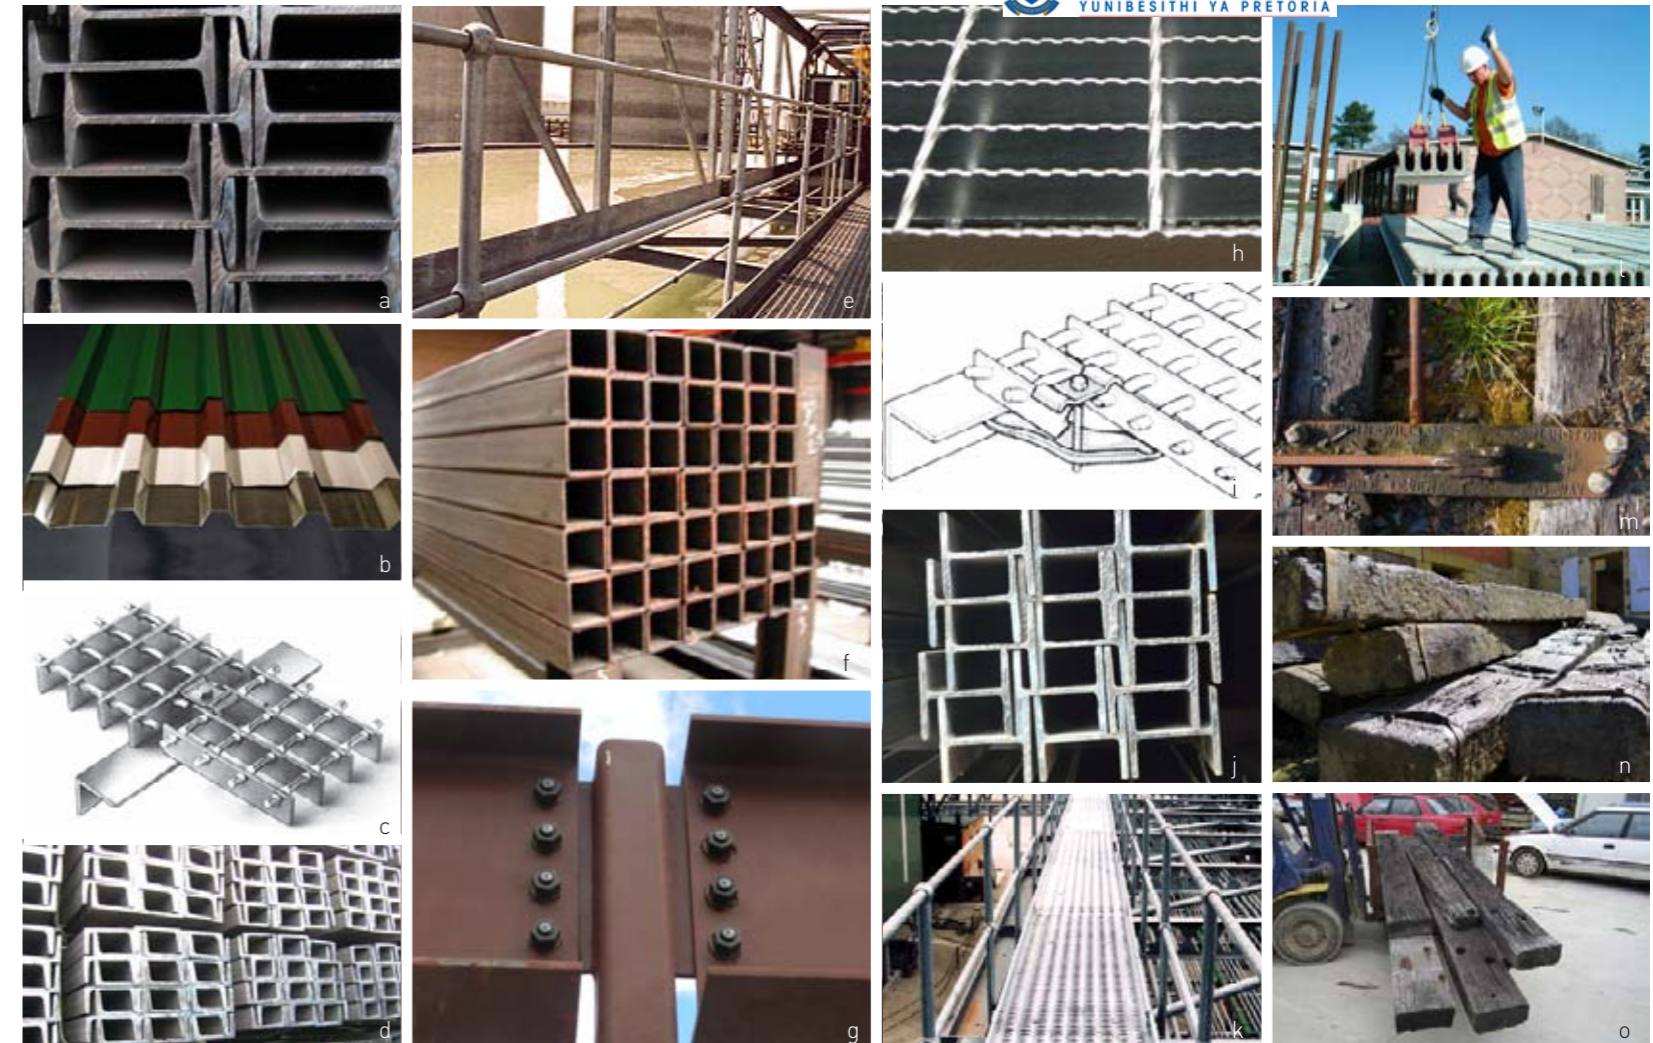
(a-k) Photo Collage of proposed steel elements (Andrew Mentis 2006)
